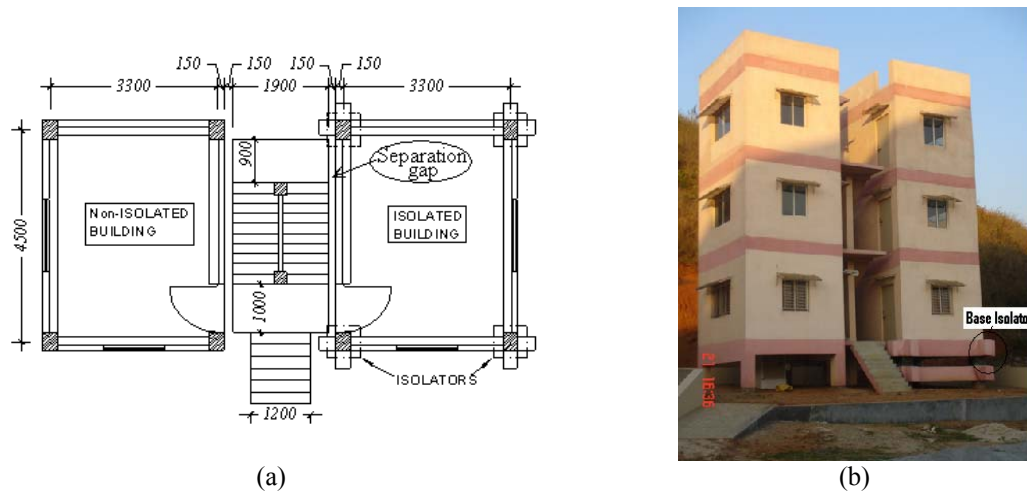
(a) Plan of conventional and isolated building showing position of isolators; (b) View of conventional building to the left and isolated building to the right
